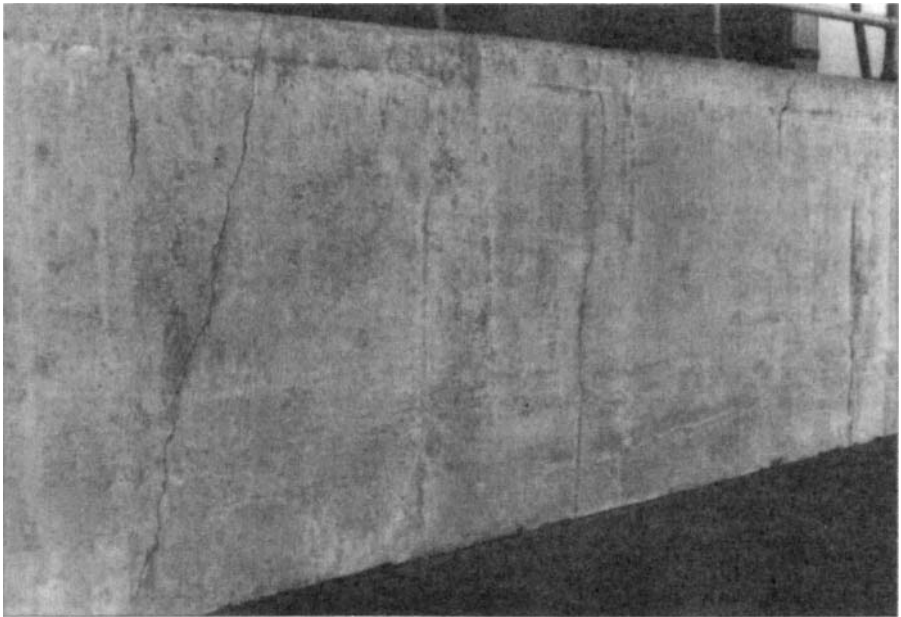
Settlement cracks. Three vertical cracks about 1.5 m apart in this wall section were caused by placing base on loose soil. Sidewalk joints are on 1.5 m spacing. Wall cracks developed about 1 week after forms were stripped. Upper level supports a small parking lot. *This is not the wall designed in Example 12-6.
